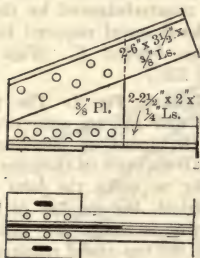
Detail of Joint A, Fink Truss, Fig. 7
